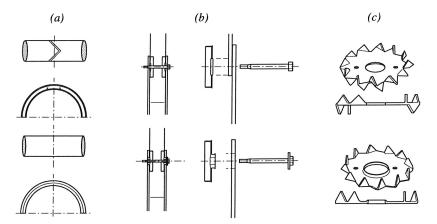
Usual timber connectors: (a) split-rings, (b) shear-plates, (c) single and double sided toothed-plates.
